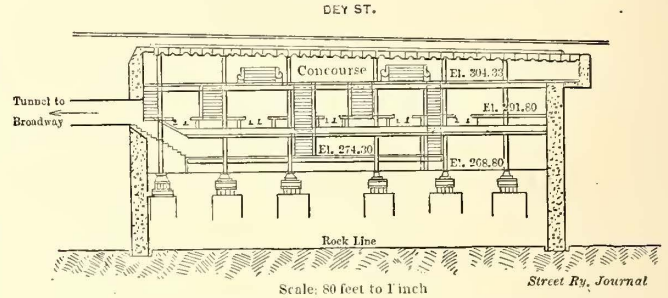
CROSS SECTION OF CORTLANDT STREET STATION
